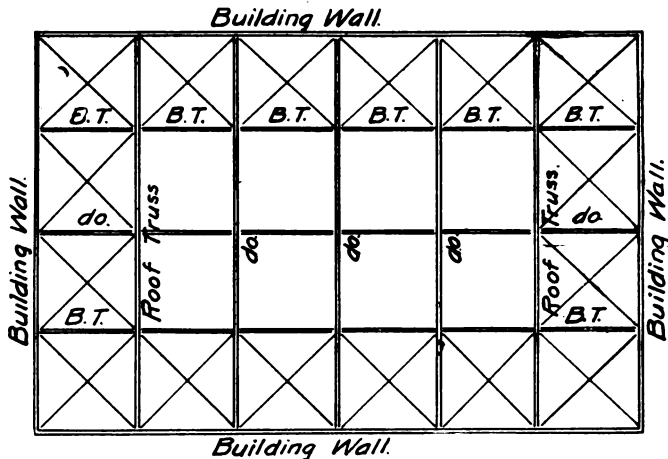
GENERAL PLAN OF BRACING-TRUSSES.
